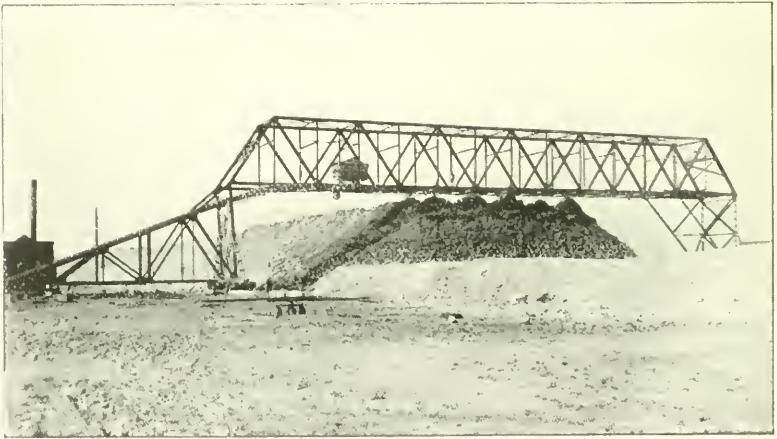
Side view of east 210-foot bridge and incline of first or upper cut; loaded car on bridge; note head and tail cables; capstan in the foreground.
